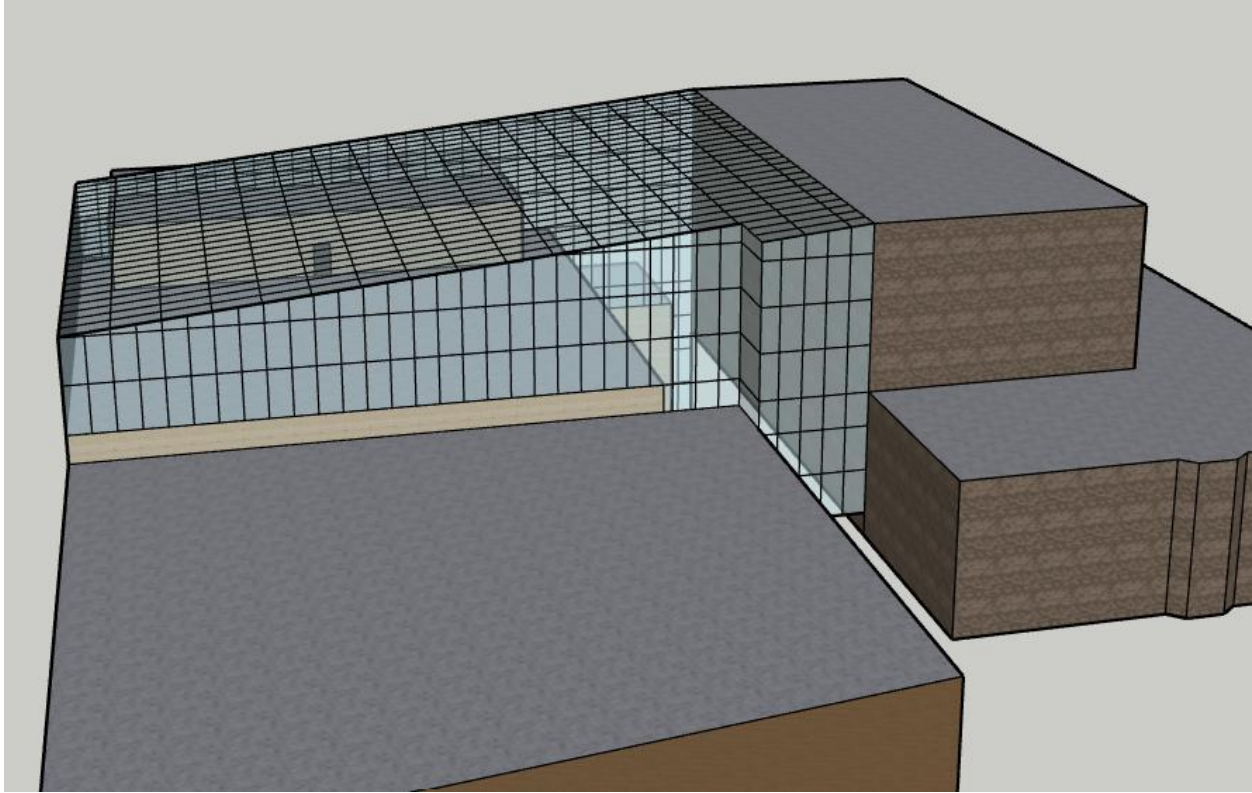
Design Concept 1 - Atrium Roof for Alumni Way and Roof
